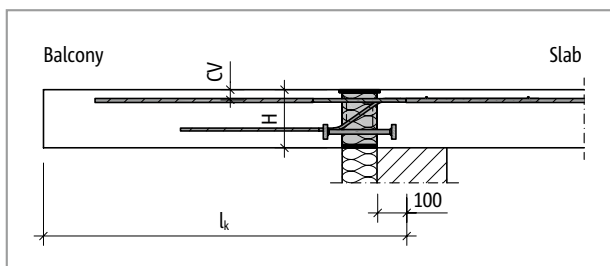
Schöck Isokorb® XT type K-M11: Static system
